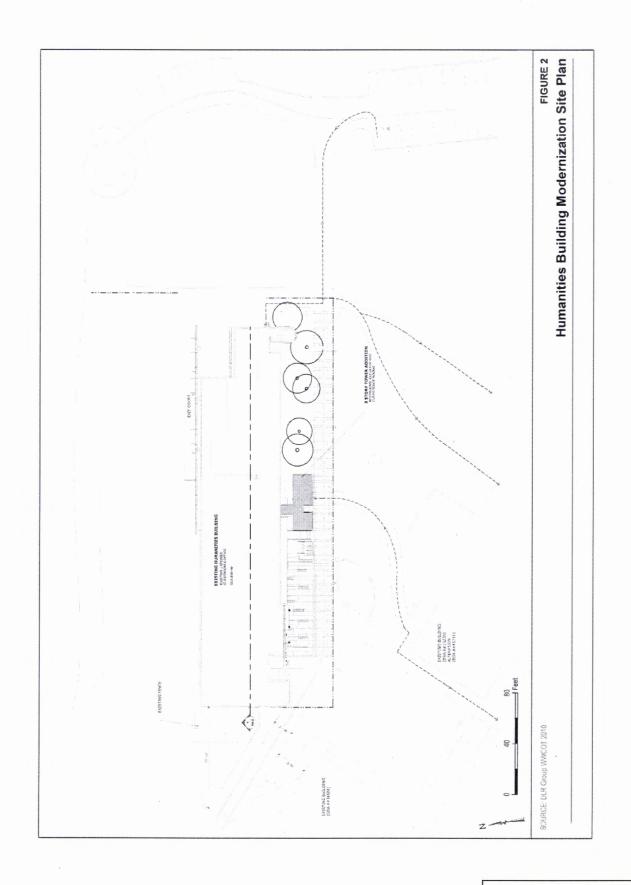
PWPA/NOID 1-2012 Site Plan
